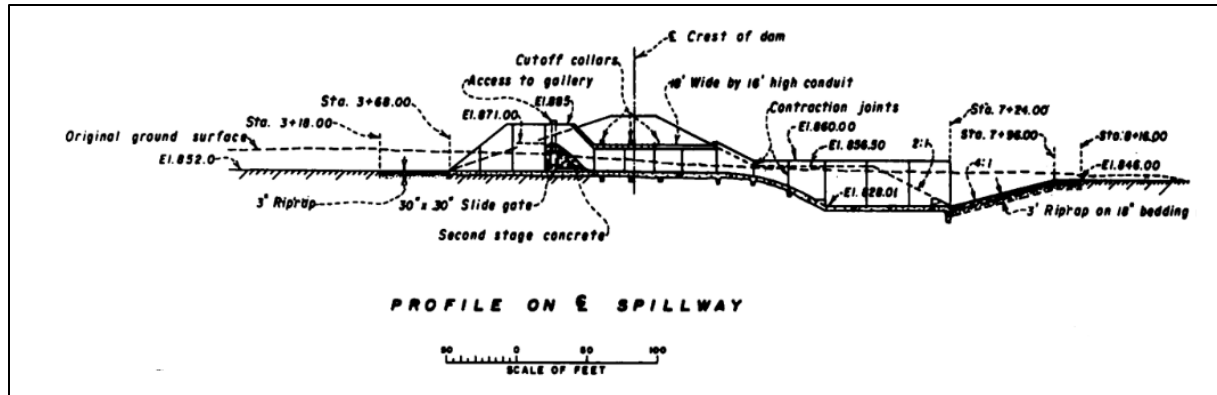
Profile view of new dam and spillway construction (USBR 1967:Figure 22).
